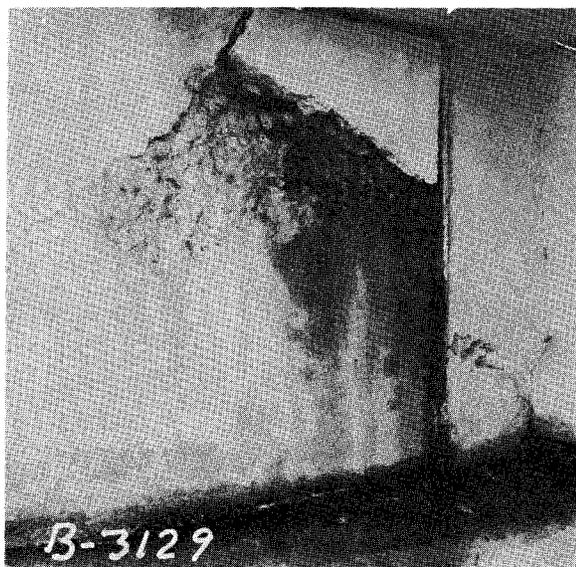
Fracture and faulting of bridge abutment wall due to pavement growth.
